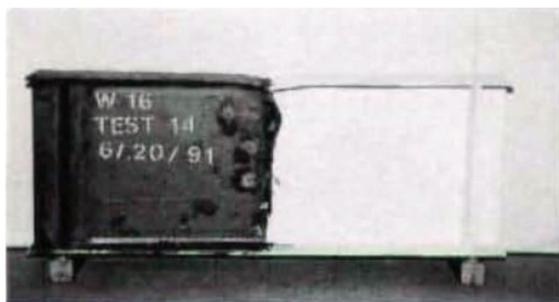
Failure mode 3—global stiffener crippling (test 14).
